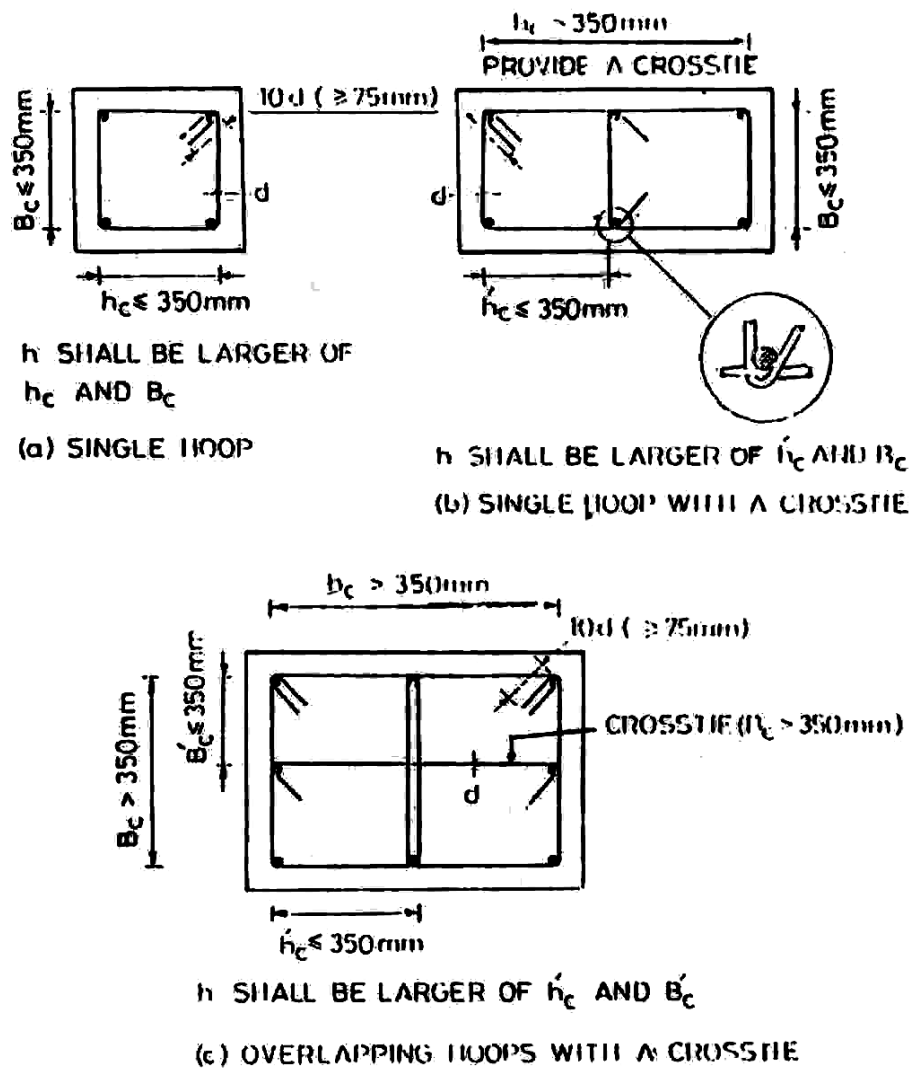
TRANSVERSE REINFORCEMENT IN COLUMN
